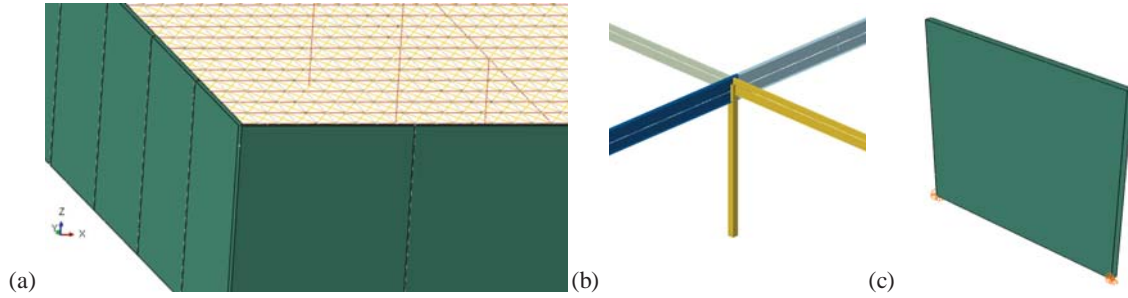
RWFD building model details (a) roof corner (b) representation of joist and joist girder connection on HSS column (c) individual wall panel, pinned at base
